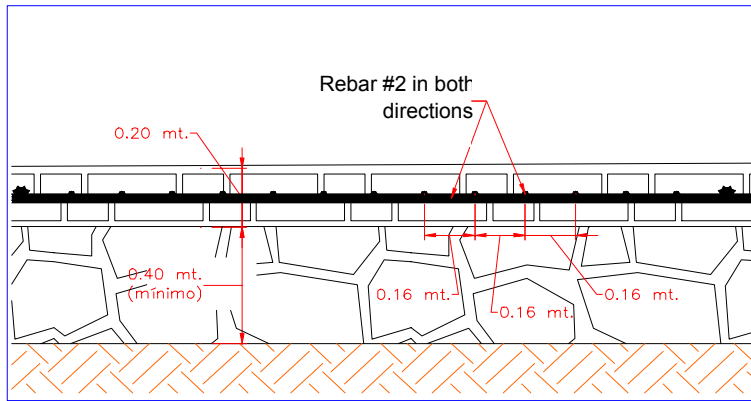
Profile view cross section of concrete roof with dimension tables and rebar details.
